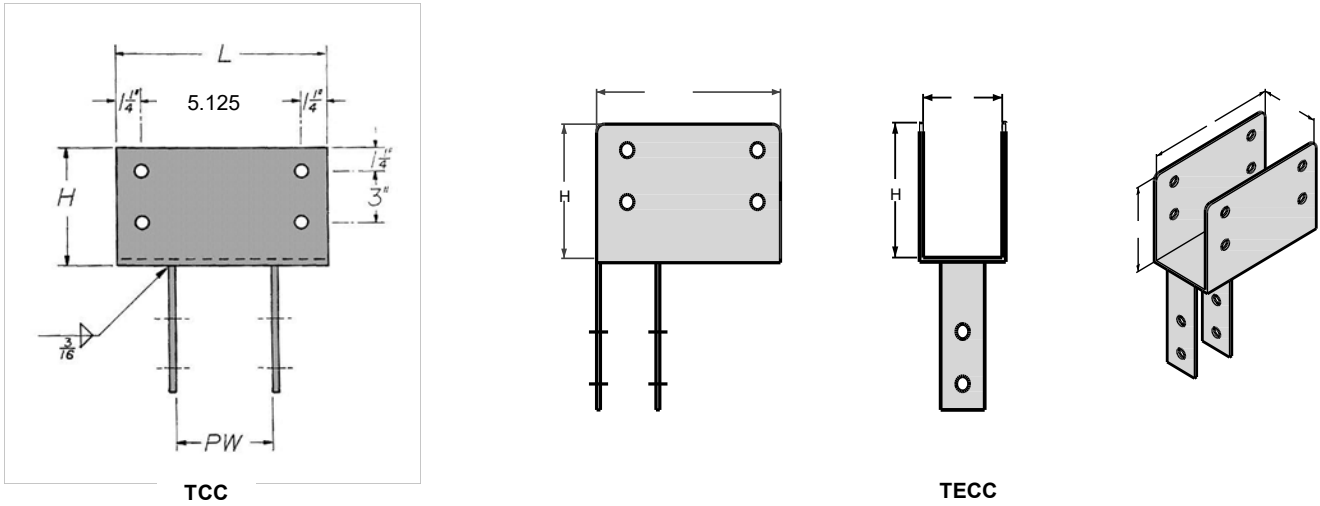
TYPICAL TCC and TECC COLUMN CAP CONNECTORS
